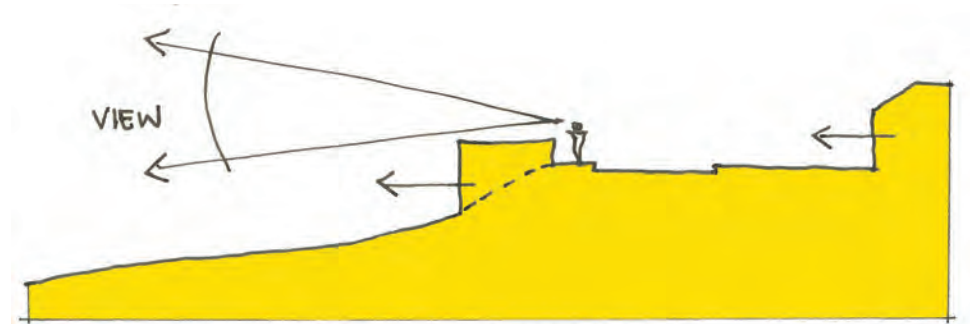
(ABOVE): Diagram showing the response to site by digging the new into the landscape and through that maintaining the connection between town and landscape. (Author)
